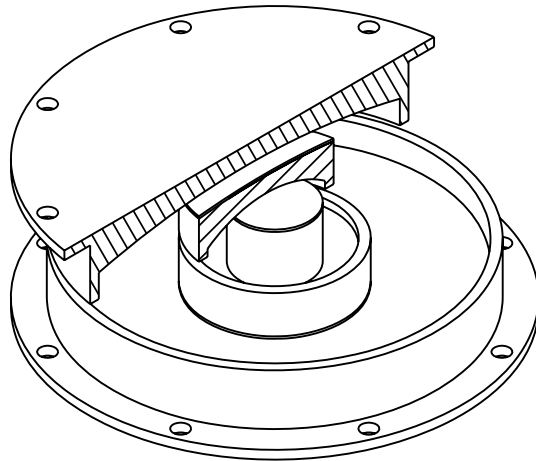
Cutaway View of the Triple FP Bearing
